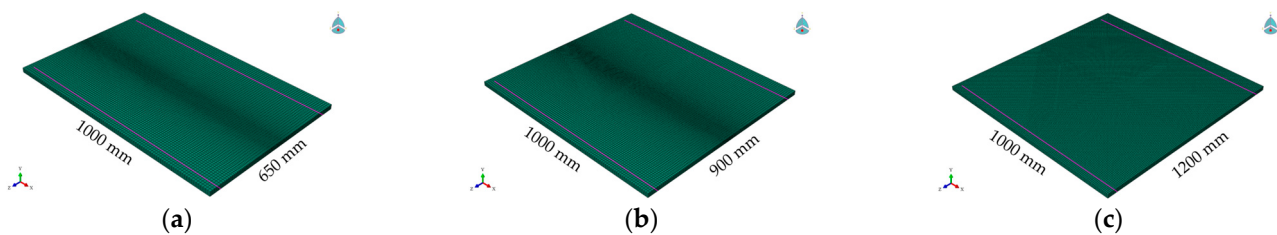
Numerical model: (a) Slab width 650 mm; (b) slab width 900 mm; (c) slab width 1200 mm.
